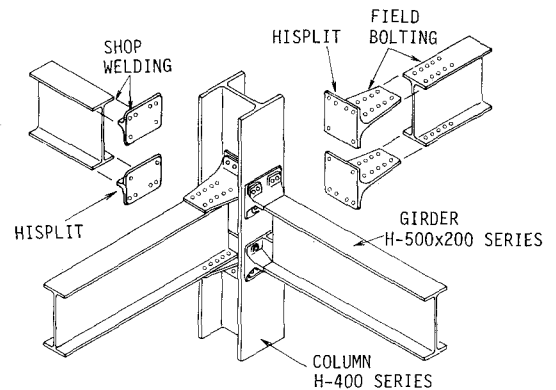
COLUMN-GIRDER CONNECTION METHOD
